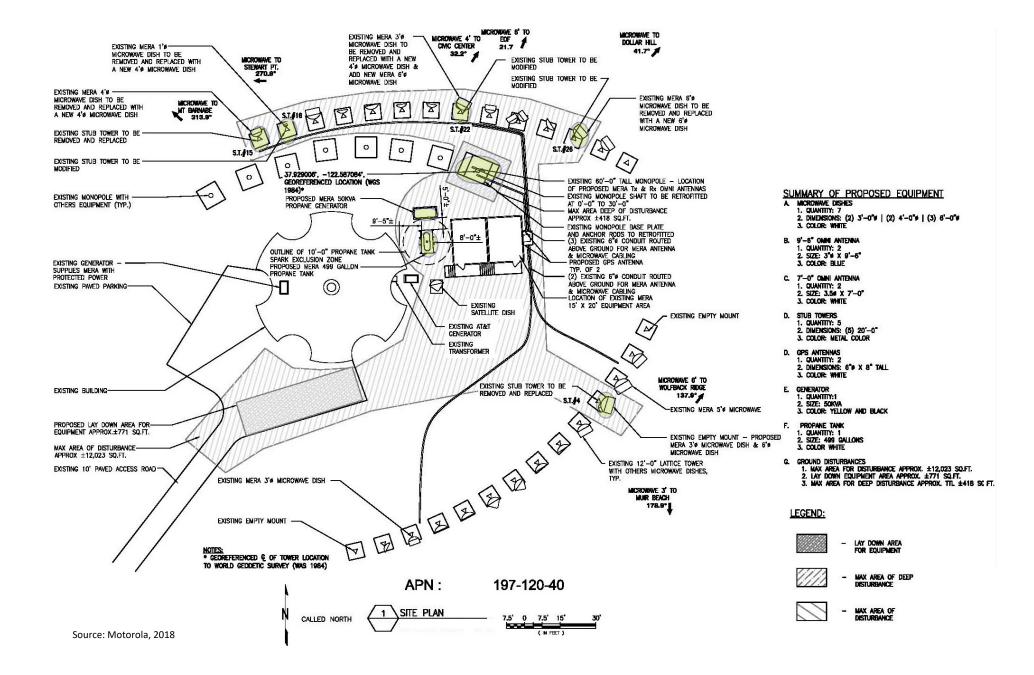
Site 4 - Mt. Tamalpais Site Plan
